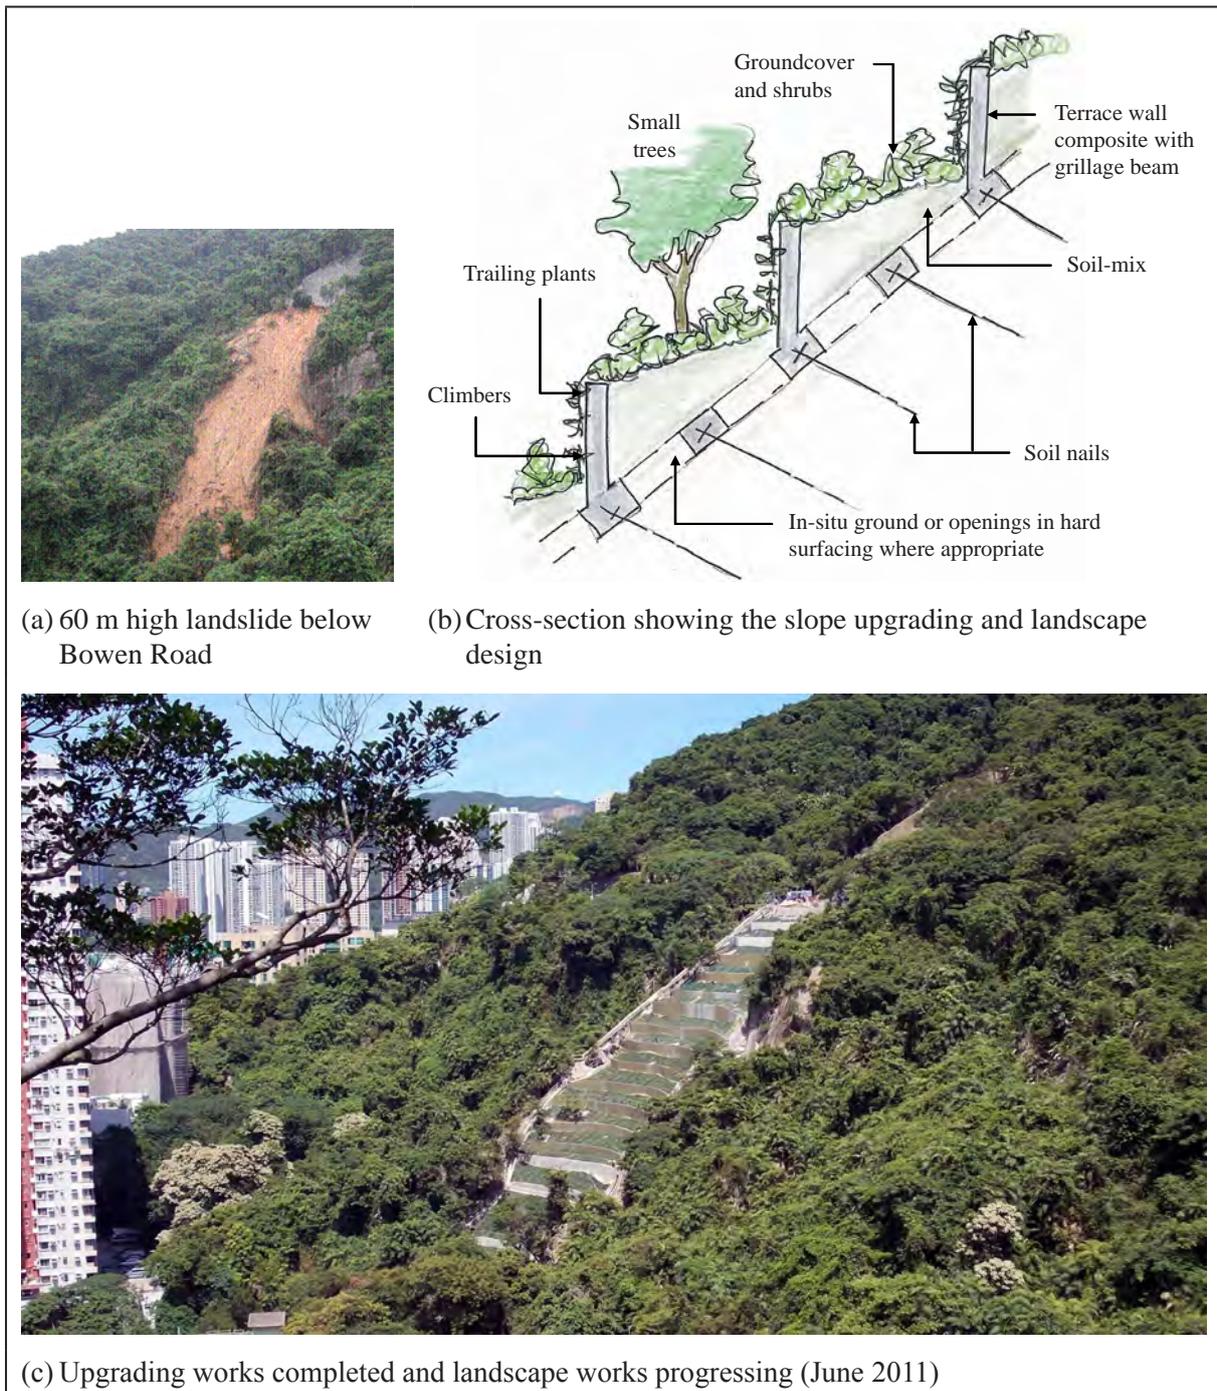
Terraced Upstands to Facilitate Placement of Soil-mix and Planting
